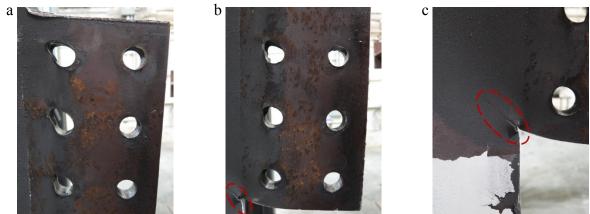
Specimen BG6-2-19-F-500C: (a) bolt bearing at plate top half, (b) bolt bearing at plate bottom half, (c) diagonal crack at bottom re-entrant corner
